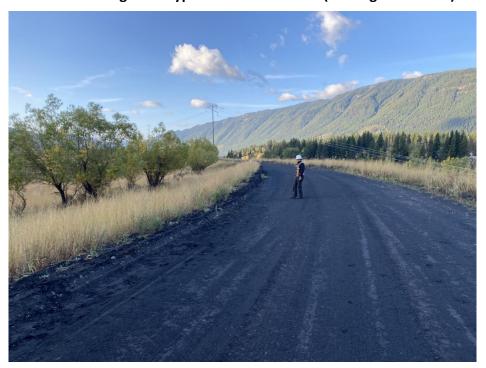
Lagoon C crest and powerlines. (looking southeast)
